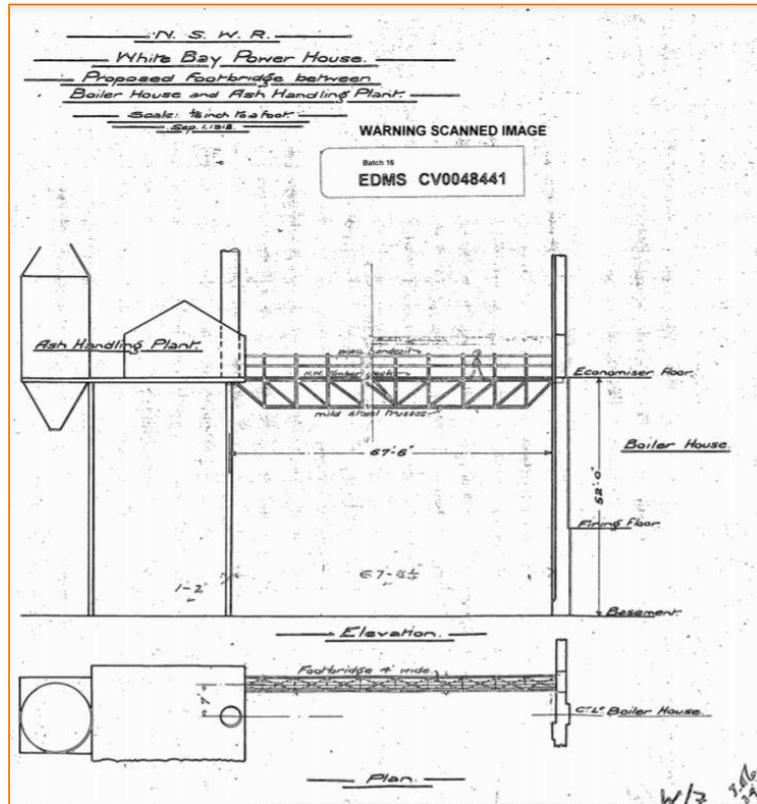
'N.S.W.R. White Bay Power House – Proposed Footbridge between Boiler House and Ash Handling Plant', 1 September 1913. Source: Transport for NSW Plan Room, 0048441
